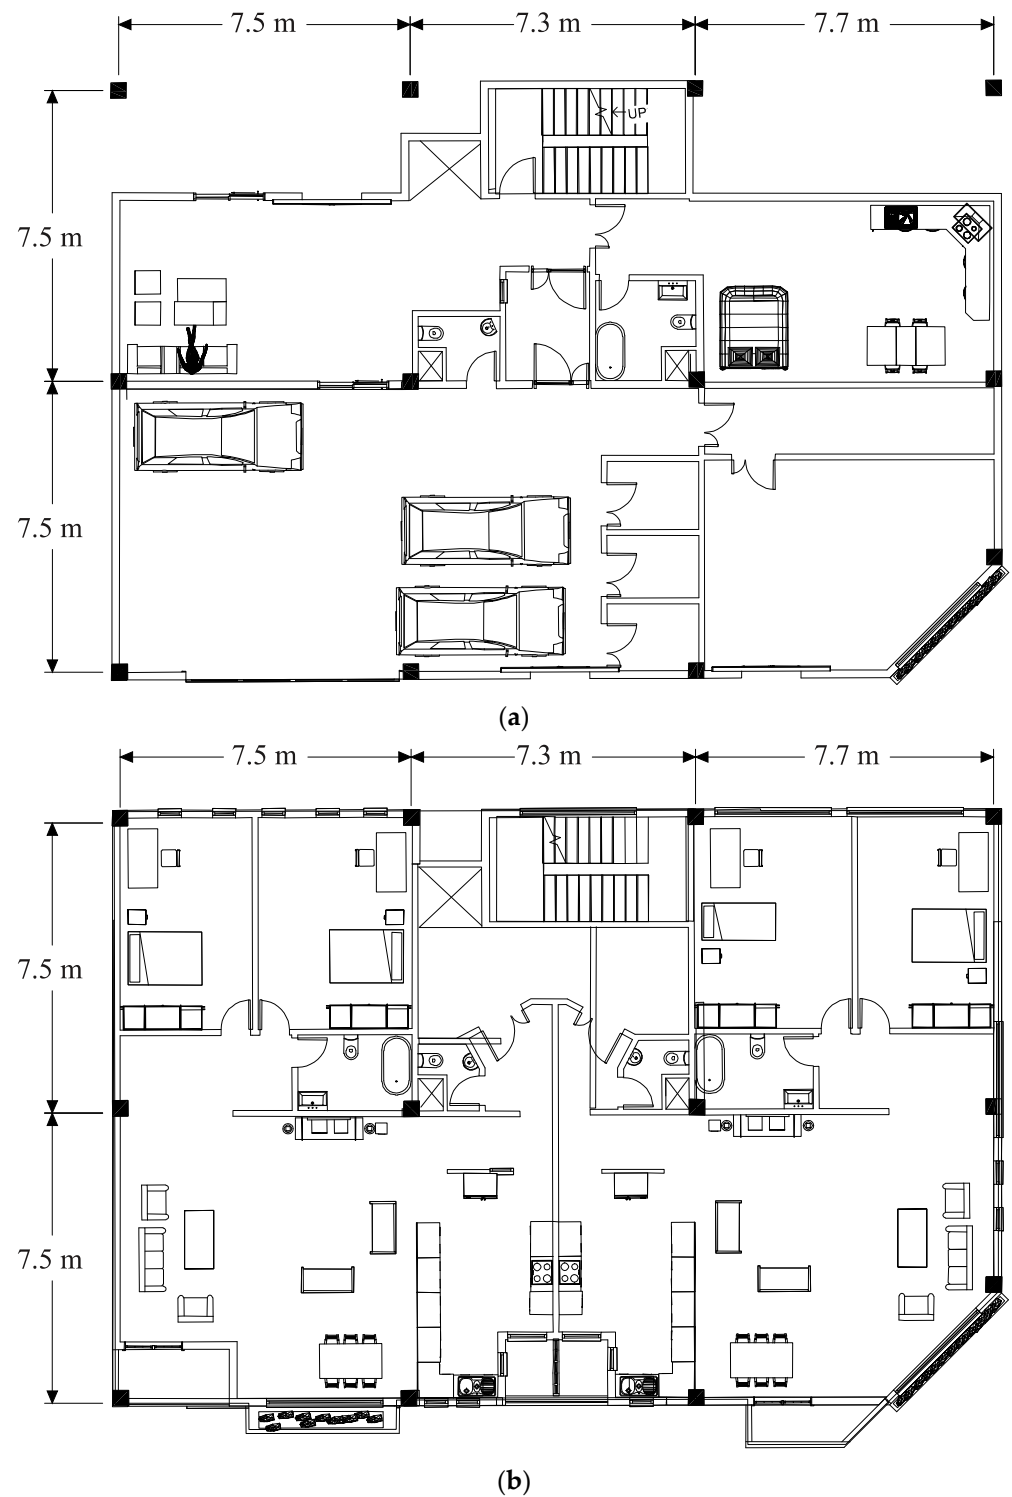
The plan of the building, (a) The first floor, (b) Other floors.
